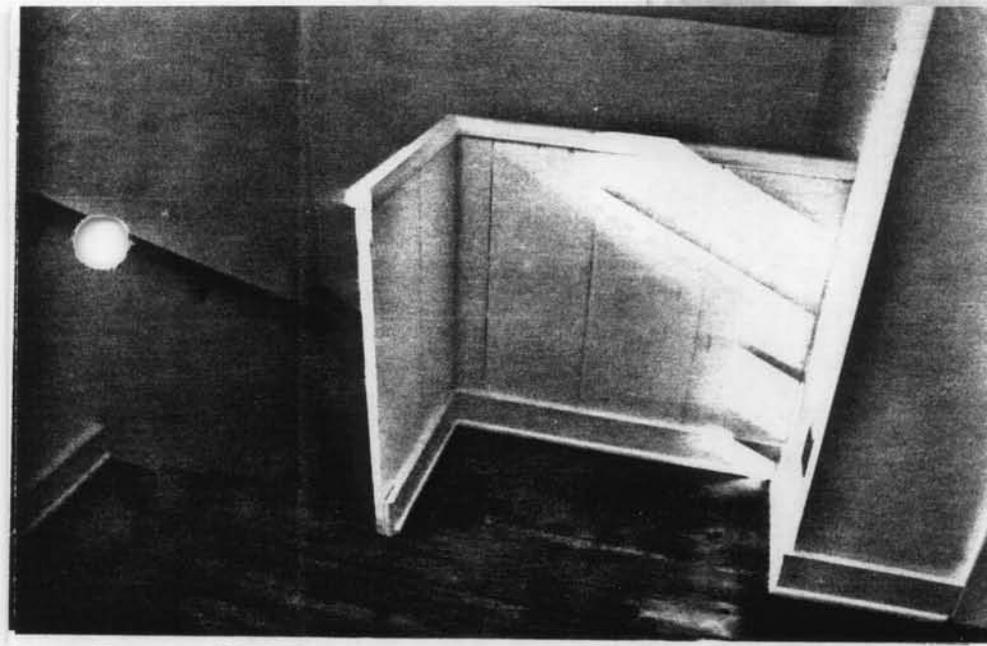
Top of stairs in attic of stone house showing historic detailing which was retained. Floors were refinished.
